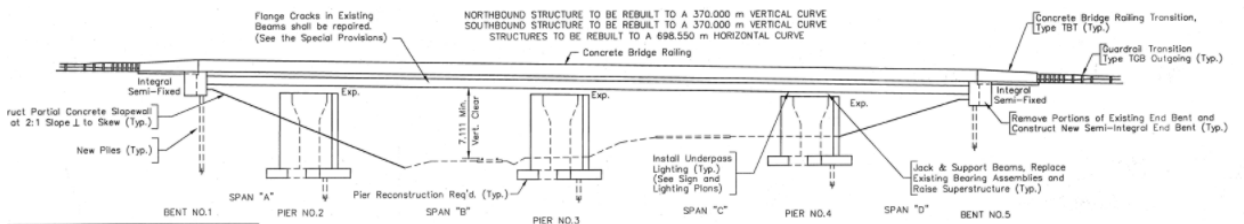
Elevation View of the Bridge (NBI 36890) (2001)
